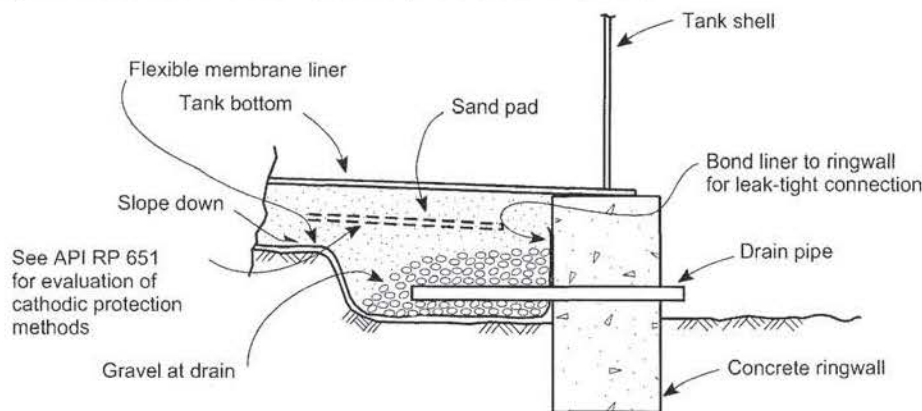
Concrete Ringwall with Undertank Leak Detection at the Tank Perimeter (Typical Arrangement)
